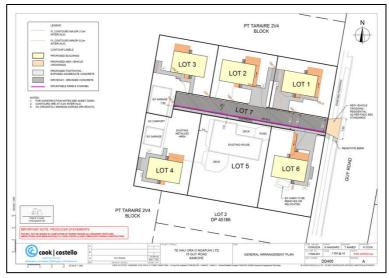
Proposed Housing Layout Plan [Source: Cook Costello]
